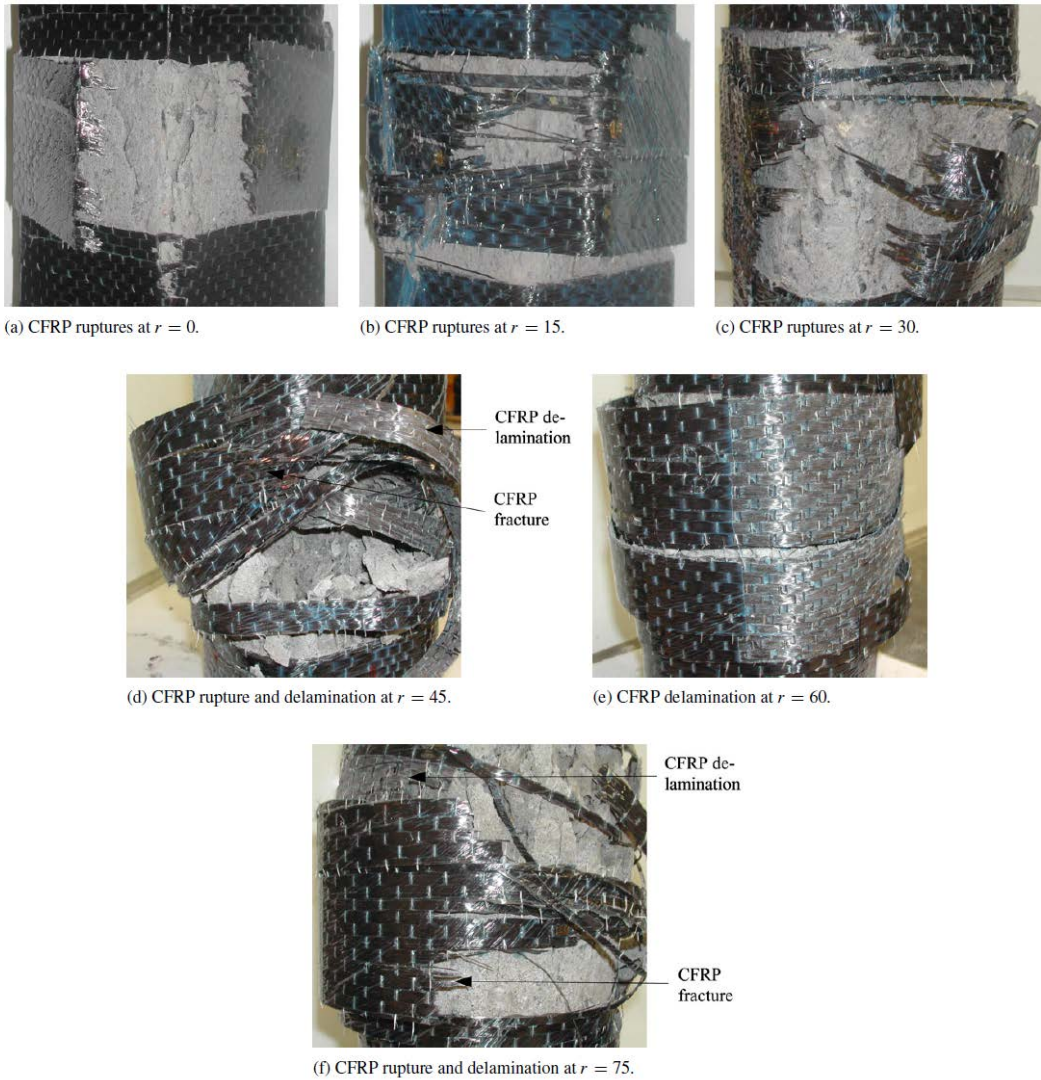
Failure modes of CFRP-confined concrete specimens (Wang and Wu 2008)
